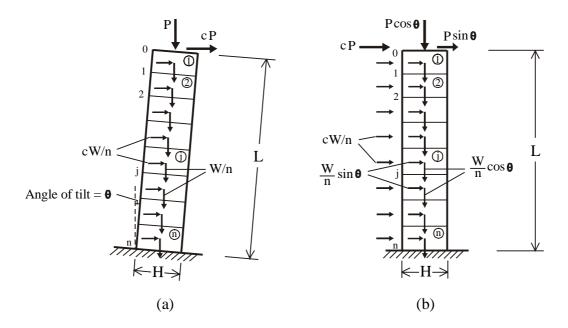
(a) Geometry and load condition of a tilted masonry wall strip, and (b) Its vertical equivalent
